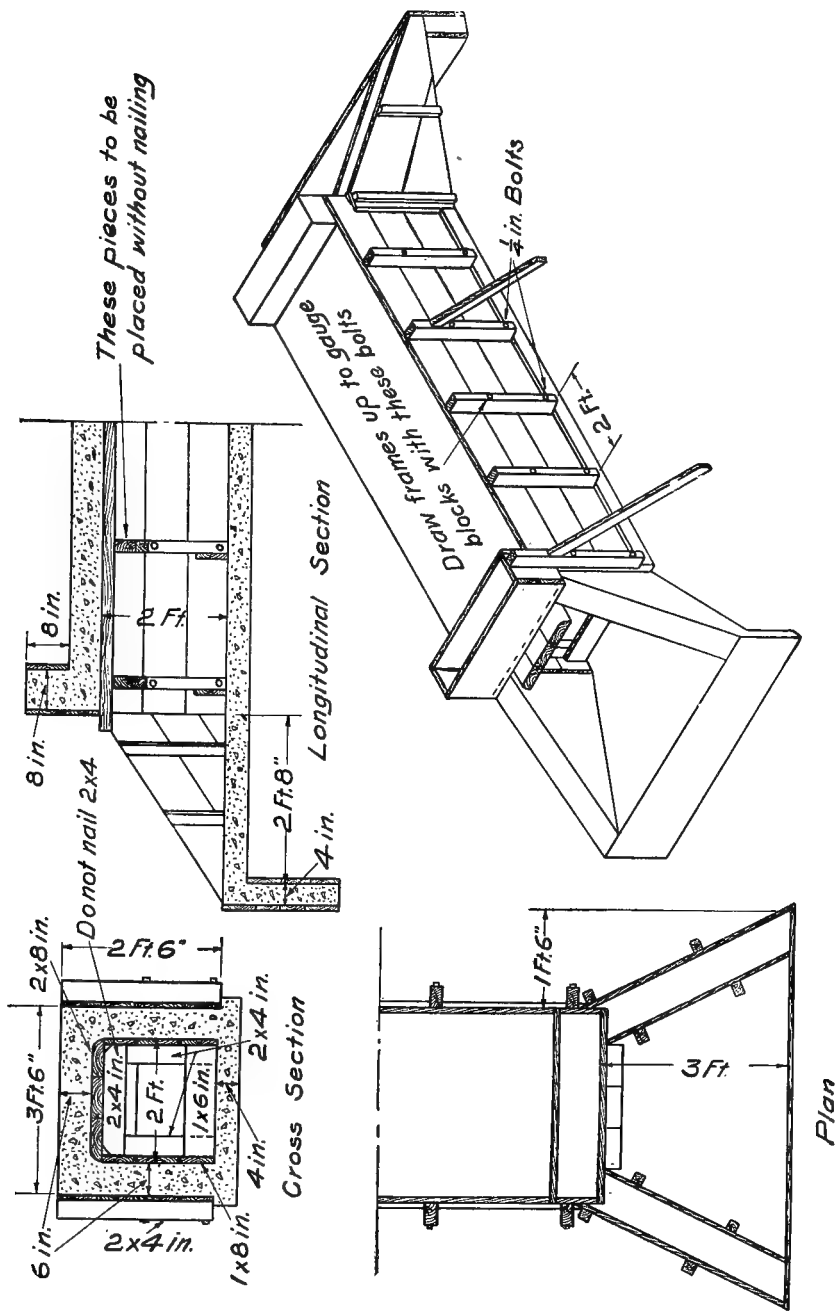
SMALL BOX CULVERT AND FORMS, IOWA STATE HIGHWAY COMMISSION.
